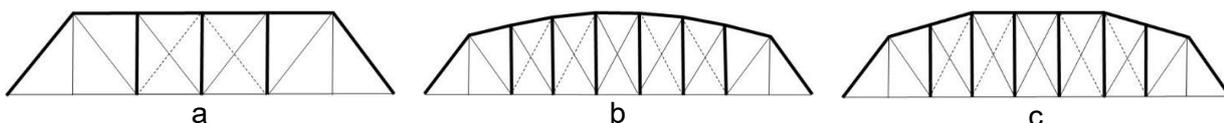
Truss configurations a) Pratt; b) Parker; c) Camelback. (Source: HAER)
